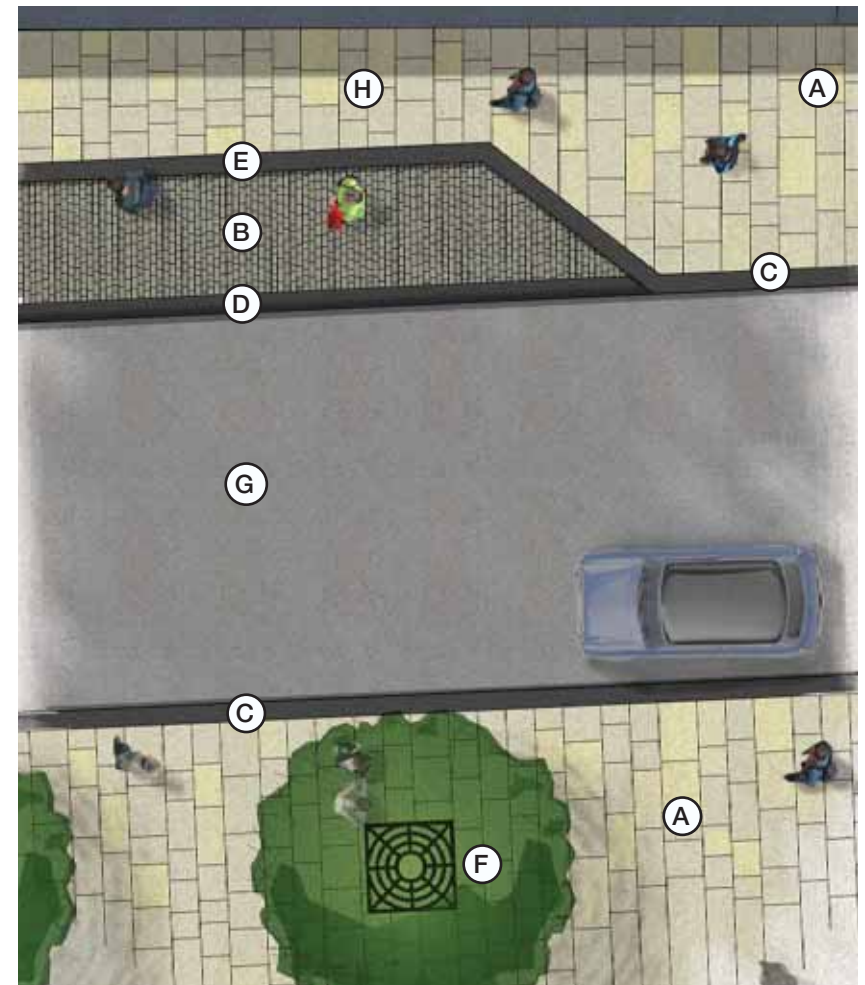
Concept sketch plan illustrating typical layout and materials of the street (Example Parliament Square/Castle Street)
